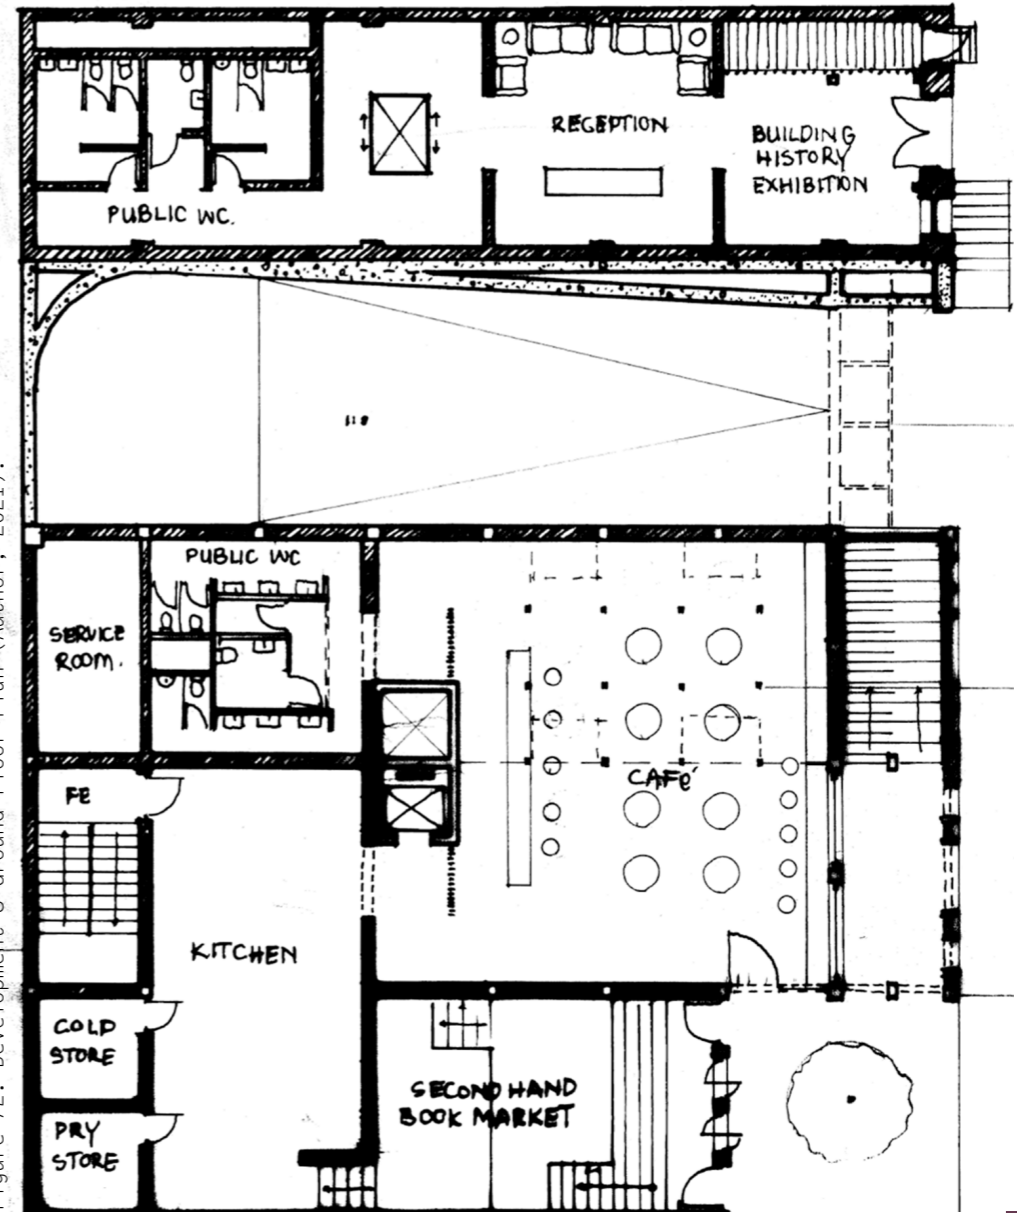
Development 8 Ground Floor Plan (Author, 2021).
